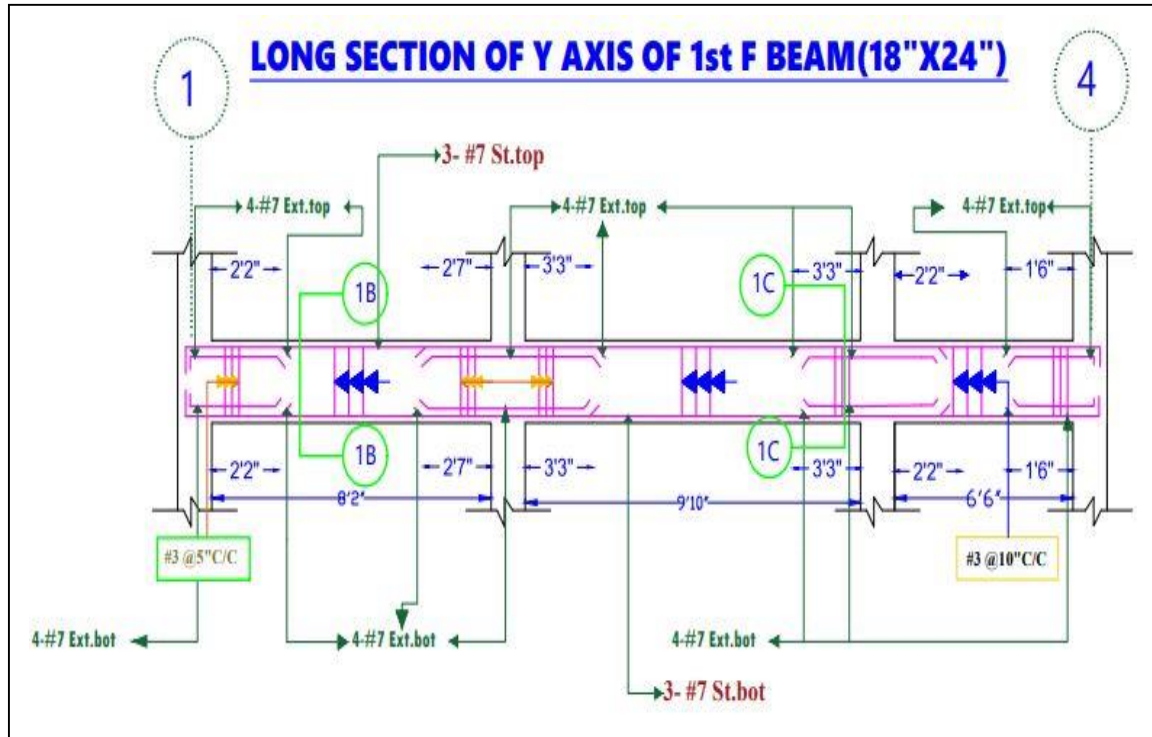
Beam Detailing & Cross Section of Y-axis
